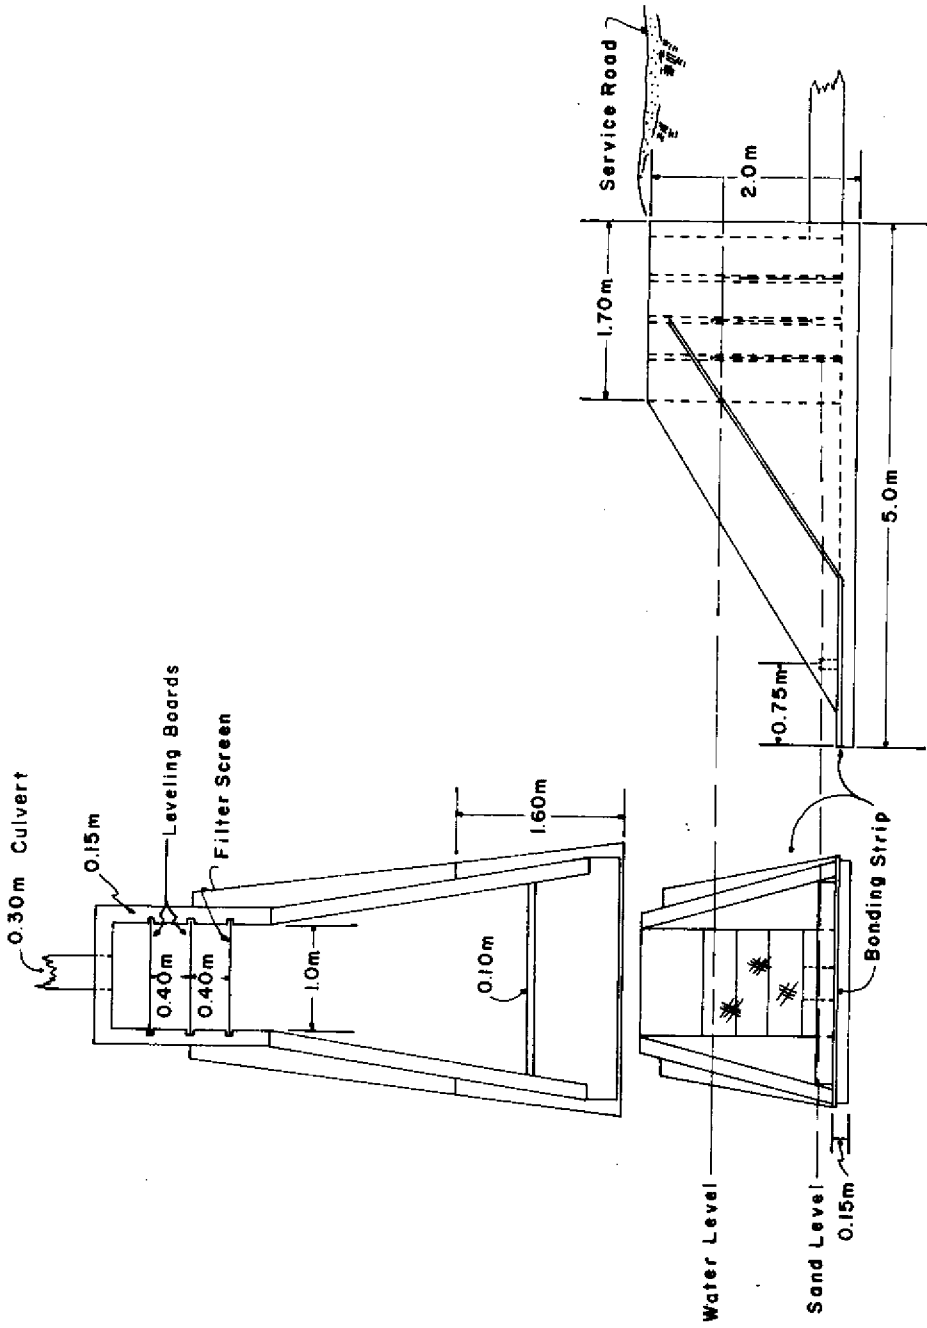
Concrete monk and culvert suggested for a grow-out unit in Option 1. The monk has a filter to catch swimming worms. Water level is adjusted by adding or removing leveling boards.
